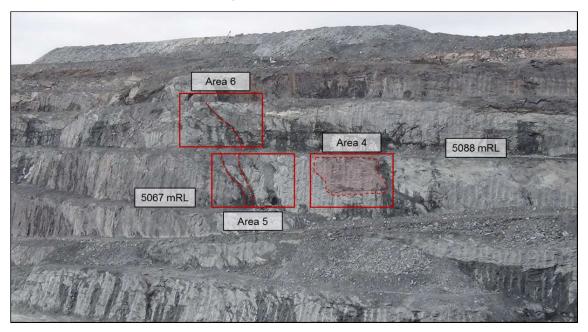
Pit E3 Ramp Areas 4 and 5 viewed from the ramp
